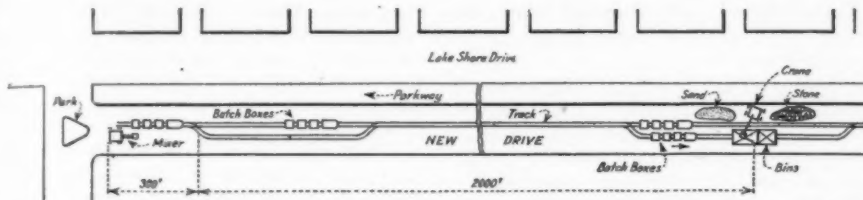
Sketch of Layout of the Work, Showing Mixer at the Left, Then the Passing Track With Waiting Train, and at the Right the Proportioning Plant With Its Equipment and the Handy Track Layout
